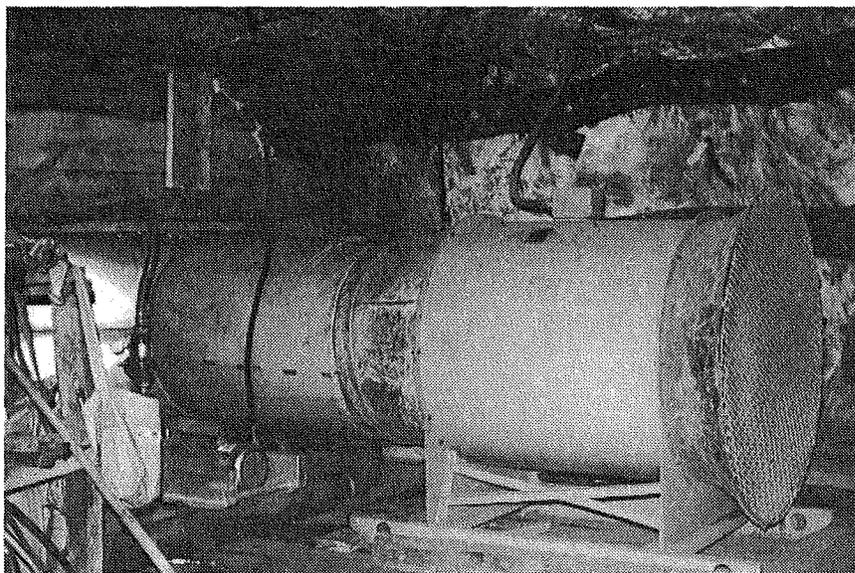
Inlet of three-stage cooler installed at the Homestake Mine.
